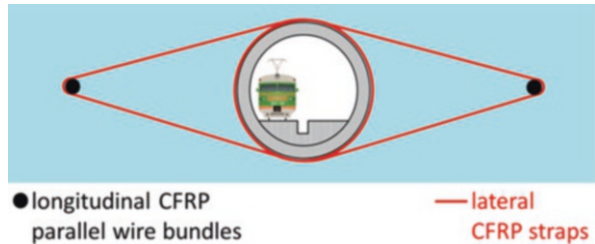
Gibraltar strait crossing: vision submerged floating tunnel at narrowest site stabilized with CFRP cables
